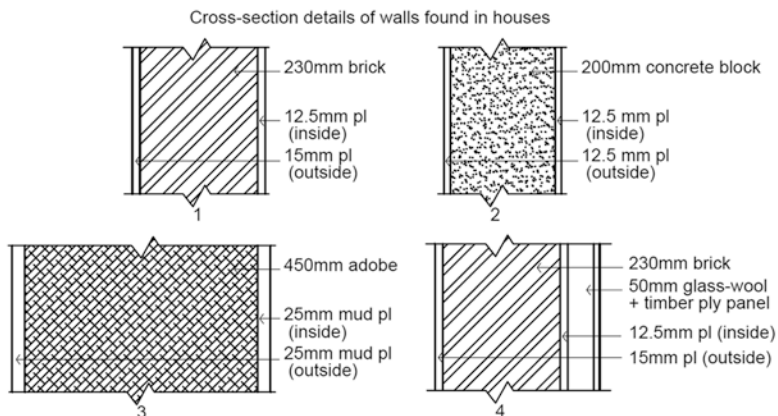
Details of walls found in houses at Hamirpur (HP)
